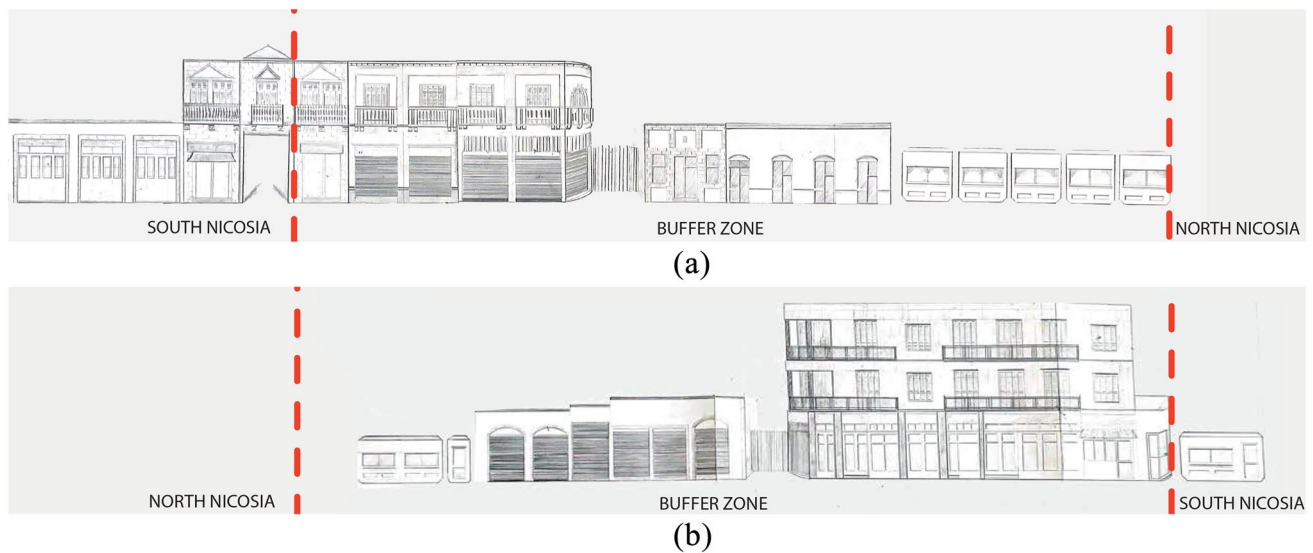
a West Silhouette of Ledra Street Crossing Point. b East Silhouette of Ledra Street Crossing Point
